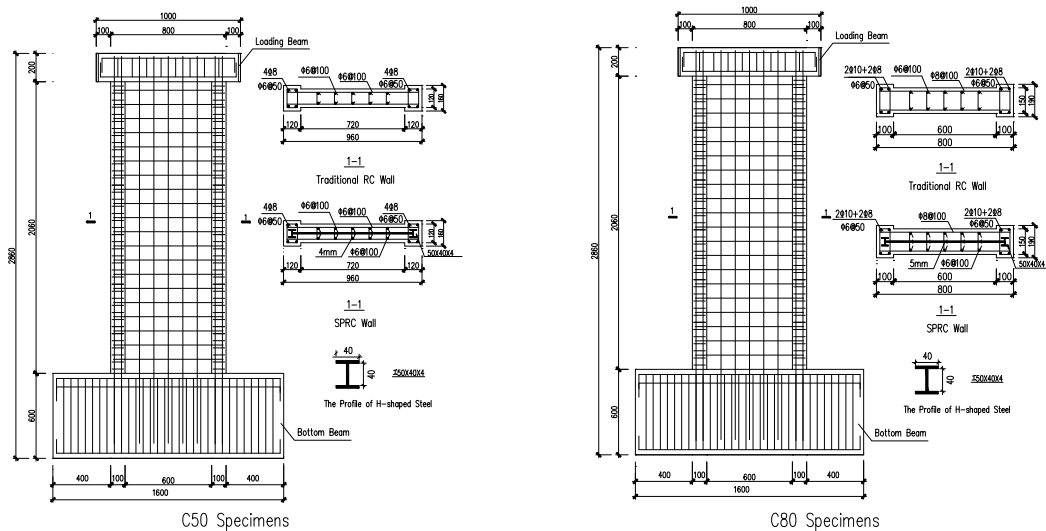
Elevations and cross-sectional configuration of test specimens
